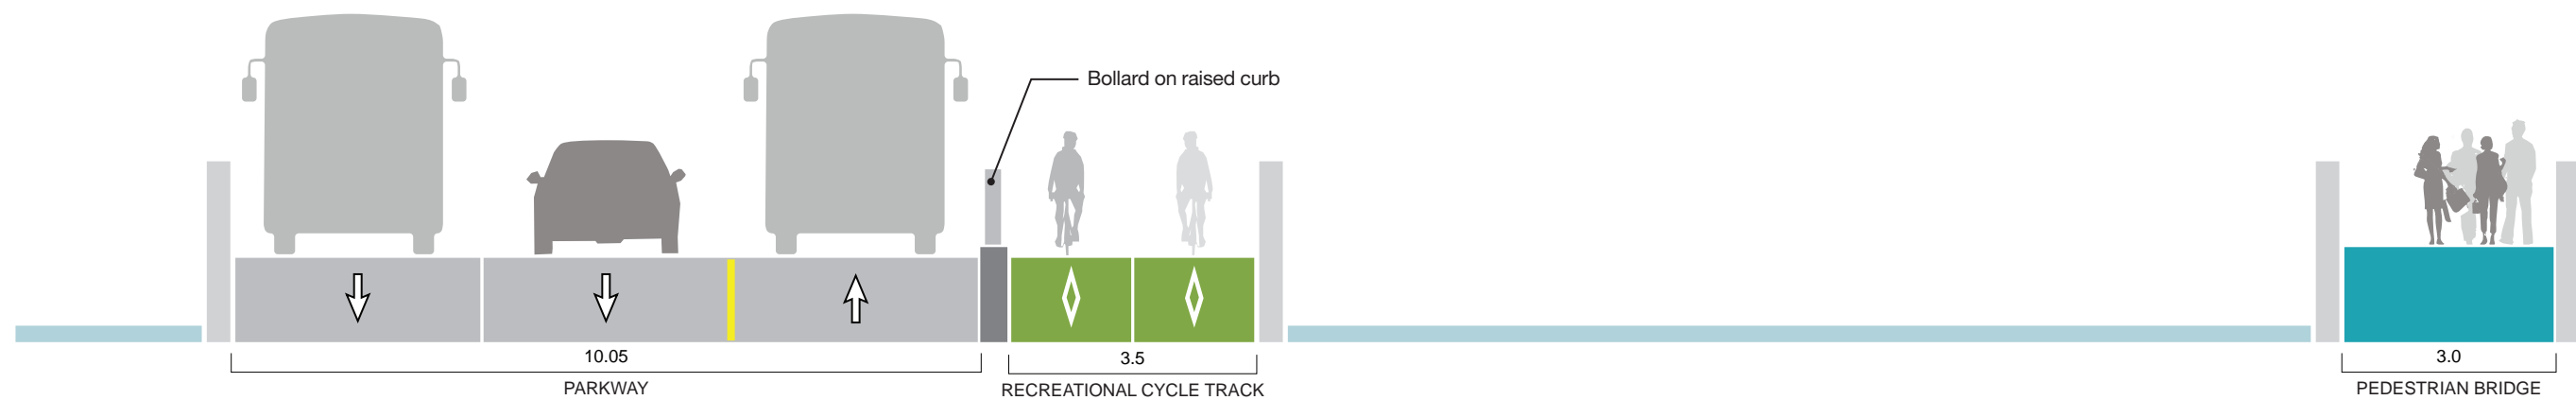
Parkway Section C1: CNPGS Bridge - looking northward
